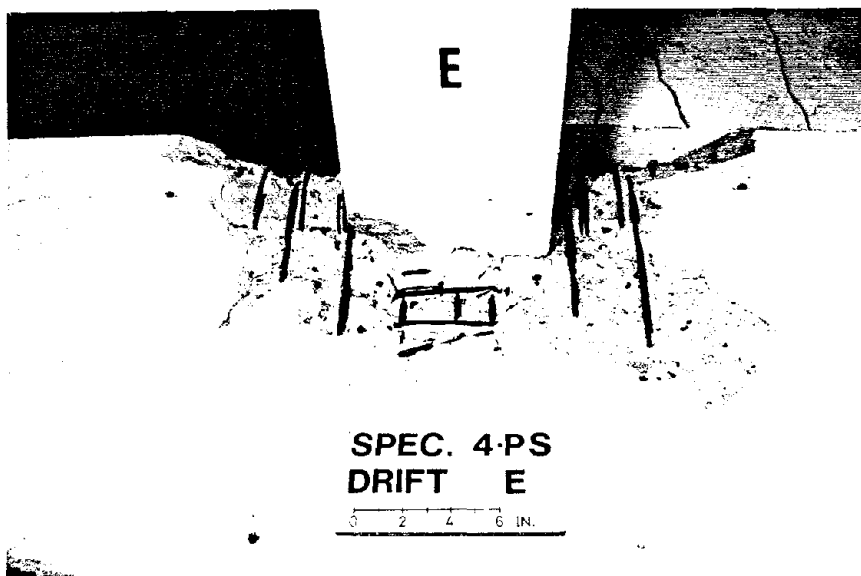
Specimen 4S - Exterior connection after 8 percent drift
